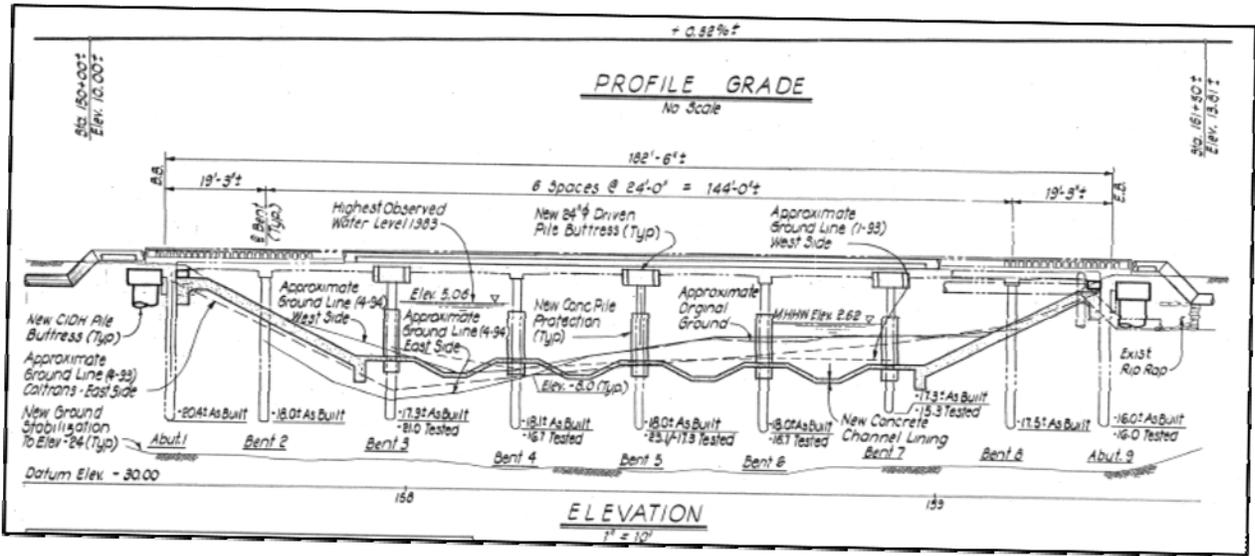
East Carlsbad Boulevard Bridge As-Built Drawing (Looking from Lagoon to Ocean)
